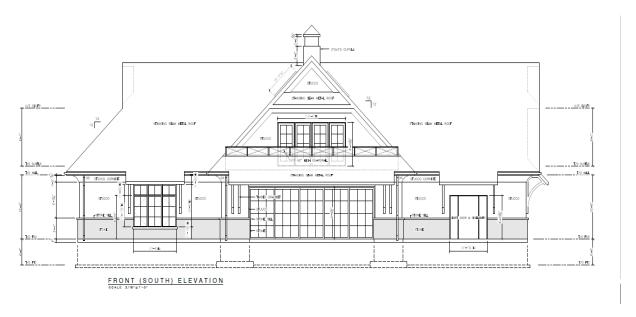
Front Elevation Proposed Accessory Structure, Barry Wade Group, 2021.
